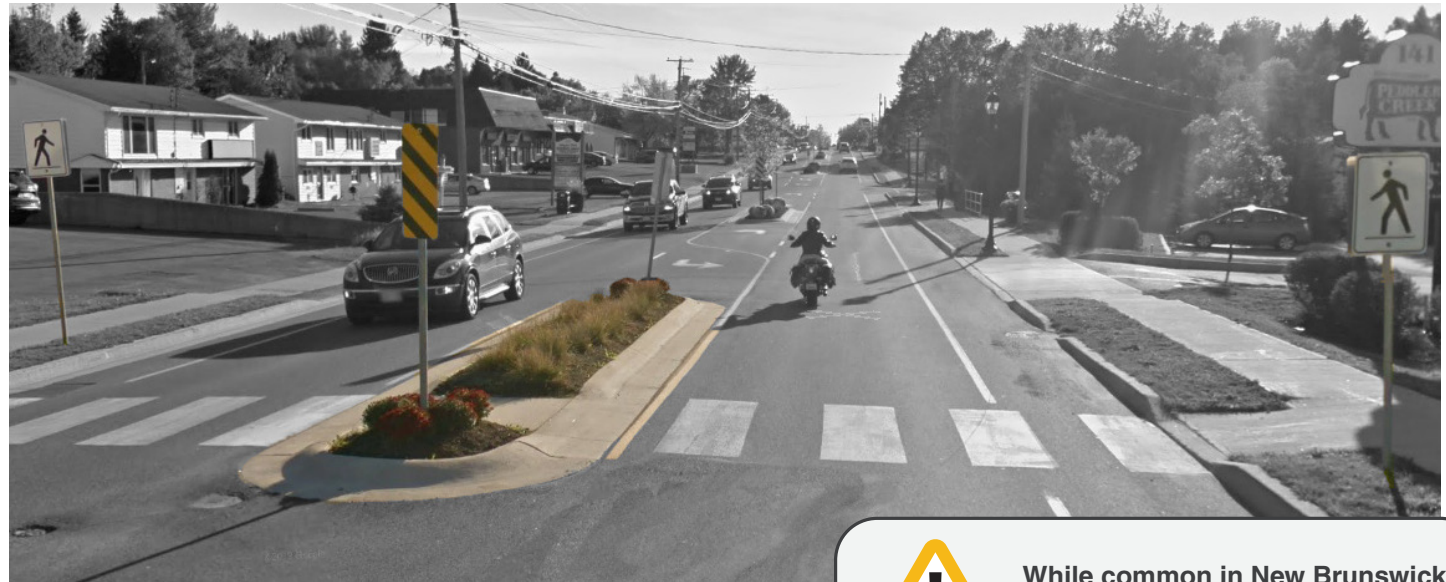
Example of a paved crosswalk median in Rothesay, NB.
